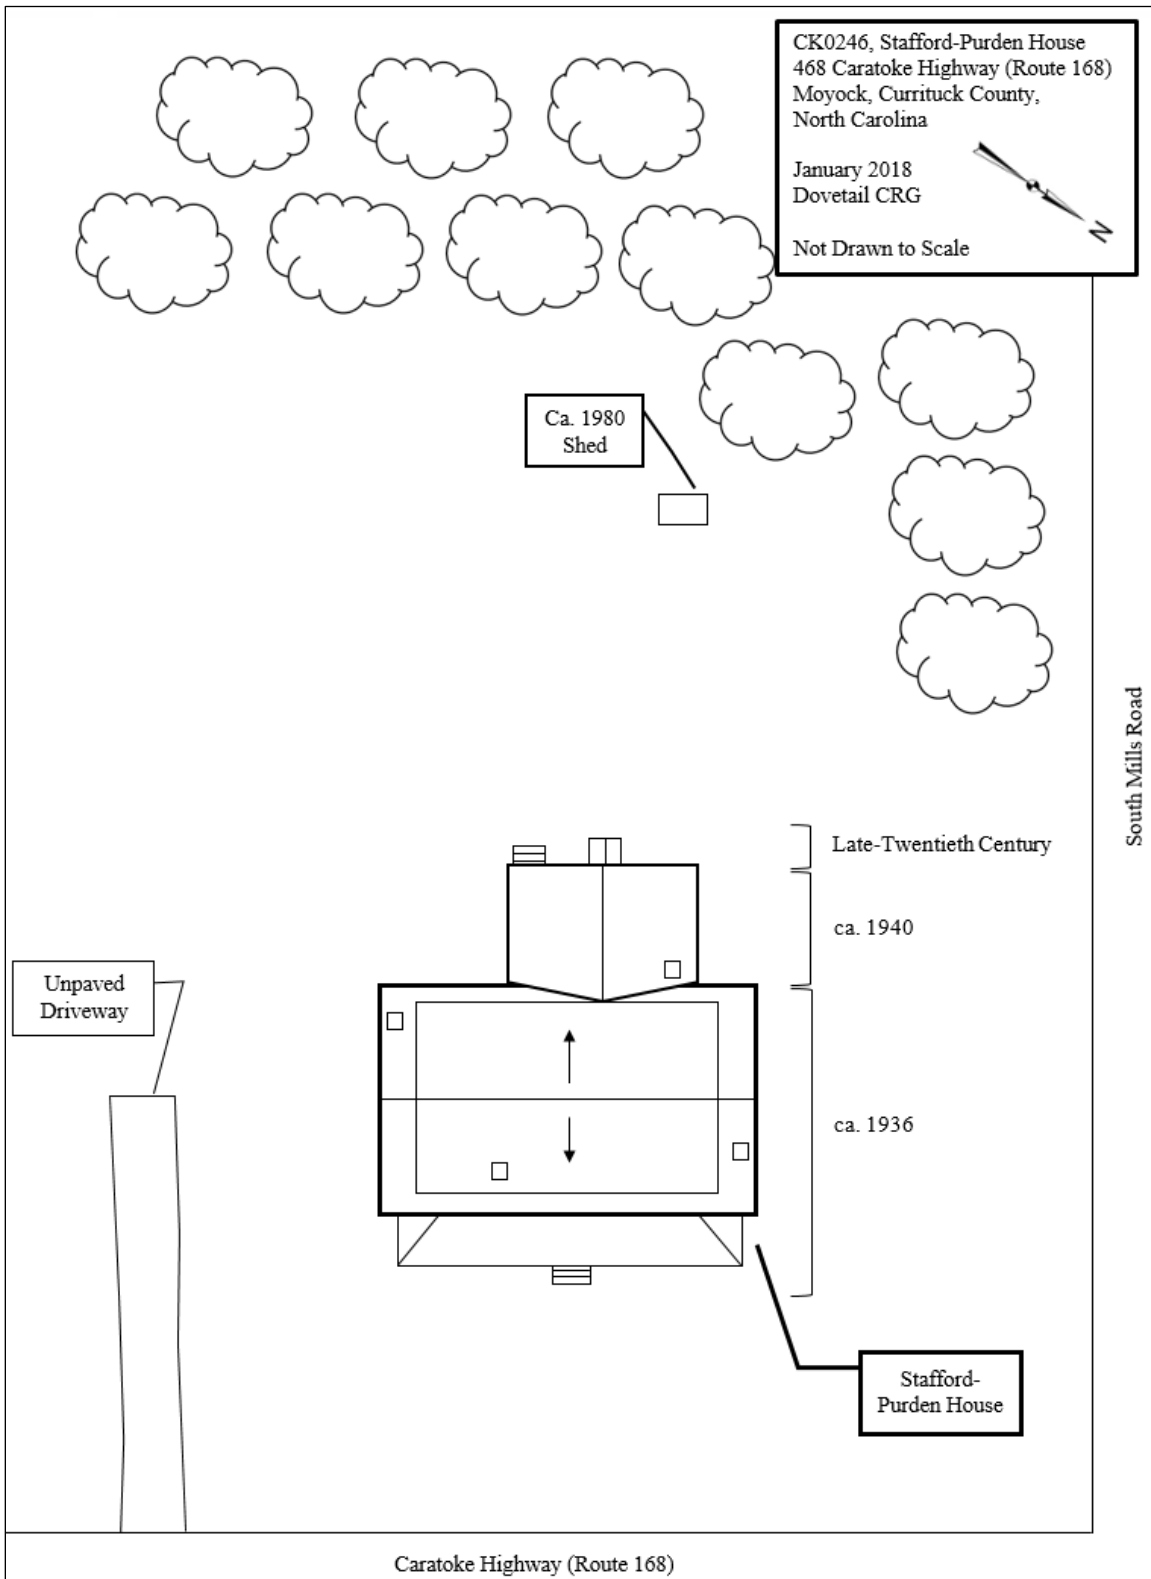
Site Plan of the Stafford-Purden House (CK0246).
